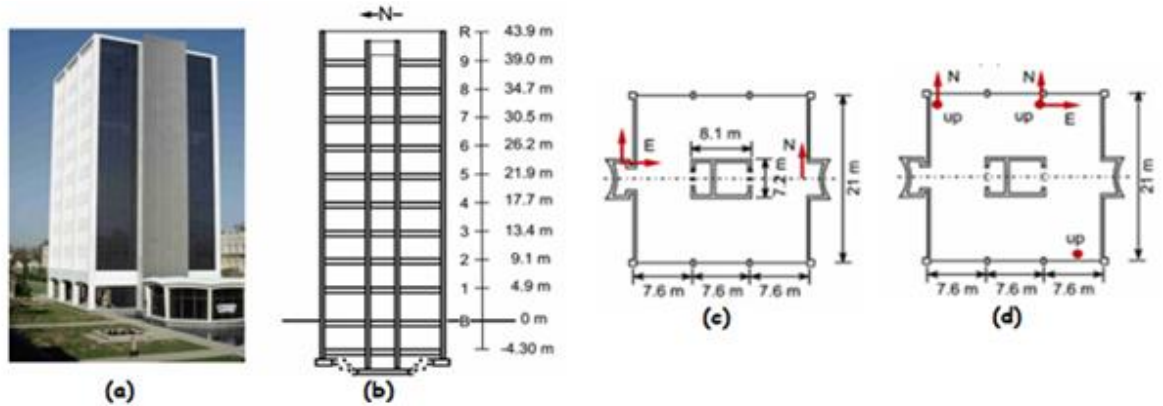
Millikan Library Building: a) Photo, b) vertical cross-section in the N-S direction, c) typical floor plan, d) basement floor plan [17]
